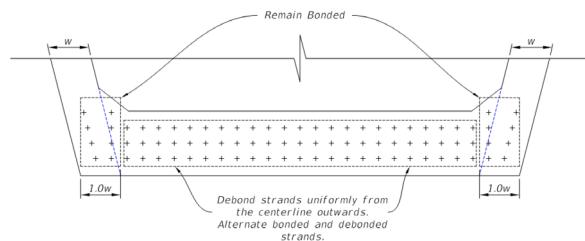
Details for Multi-Web Sections
